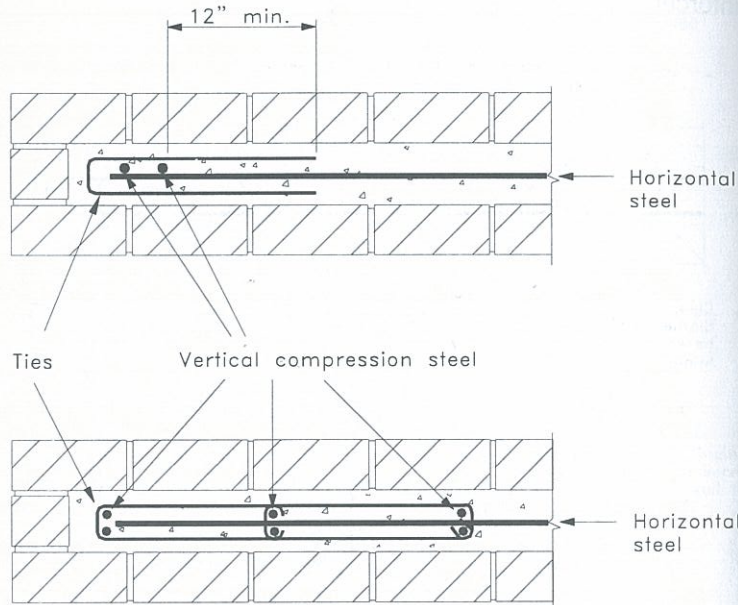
Ties for compression or jamb steel at the end of walls or piers.
